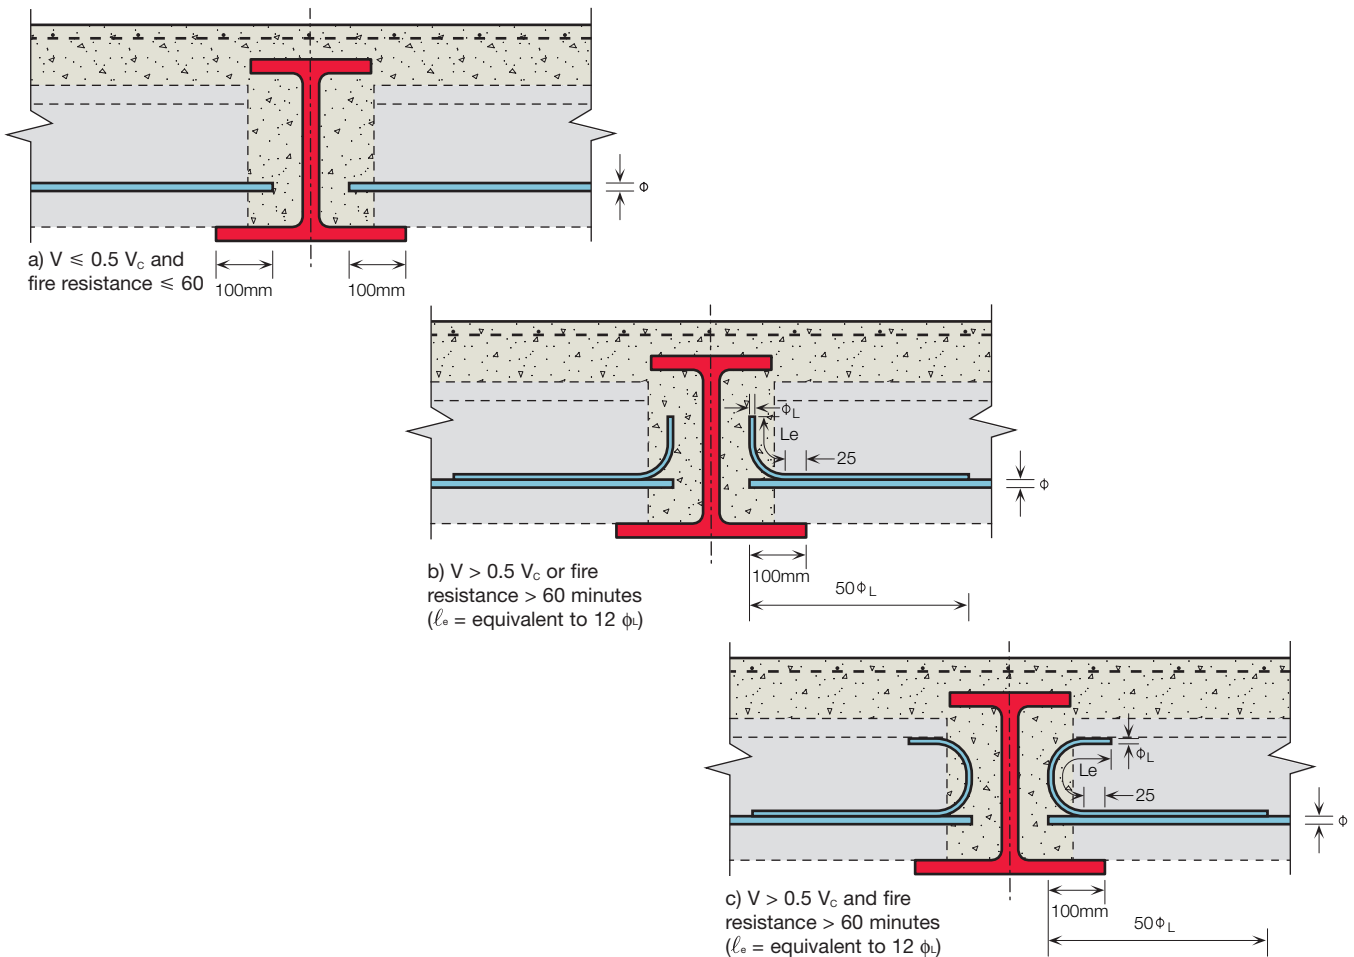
Detailing of bar reinforcement in slabs for end anchorage
